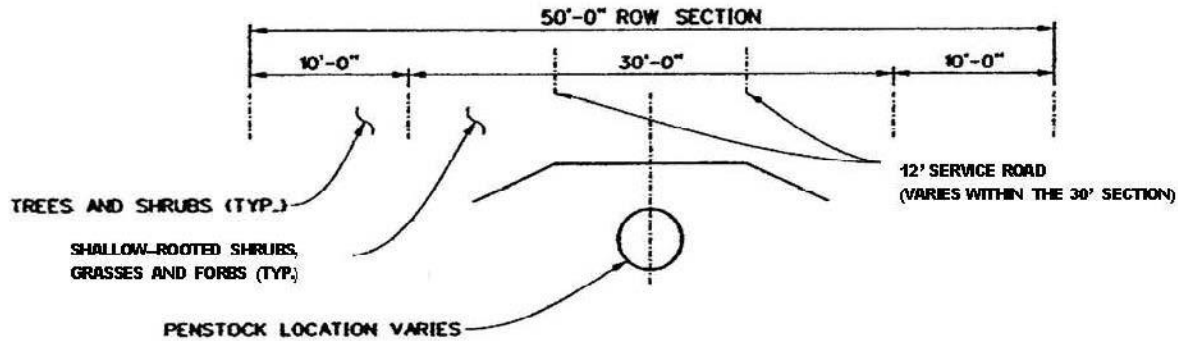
Typical cross section of penstock ROW with service road, per FERC-approved construction drawing YCH-1116.
